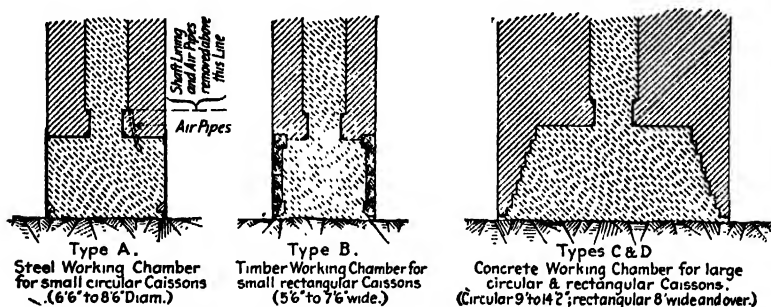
Types of Working Chambers, Municipal Building, New York.
